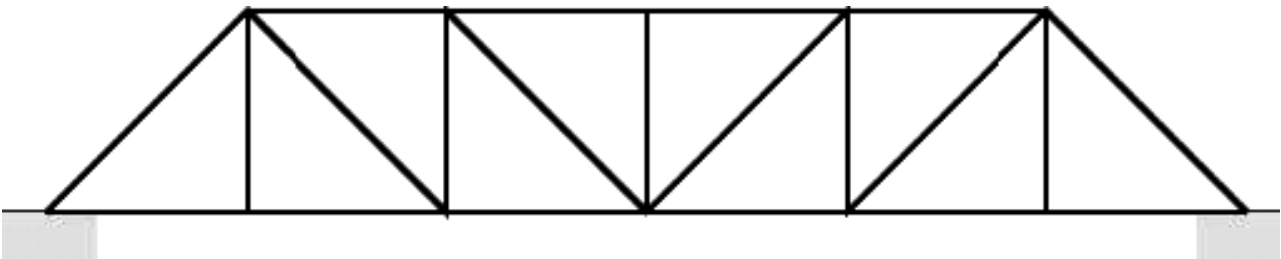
Diagram of a Pratt truss (Source: F Griggs Jr, Articles, Historic Structures, 'The Pratt Truss', Structure Magazine, [online], June 2016:46)
